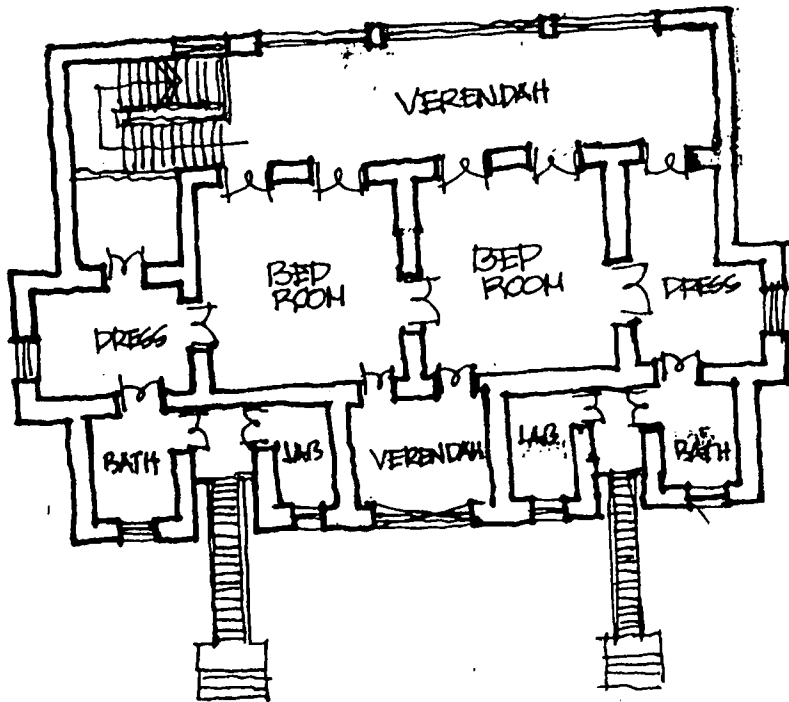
First floor plan, Bungalow no-29, Ramna colony, Dhaka
